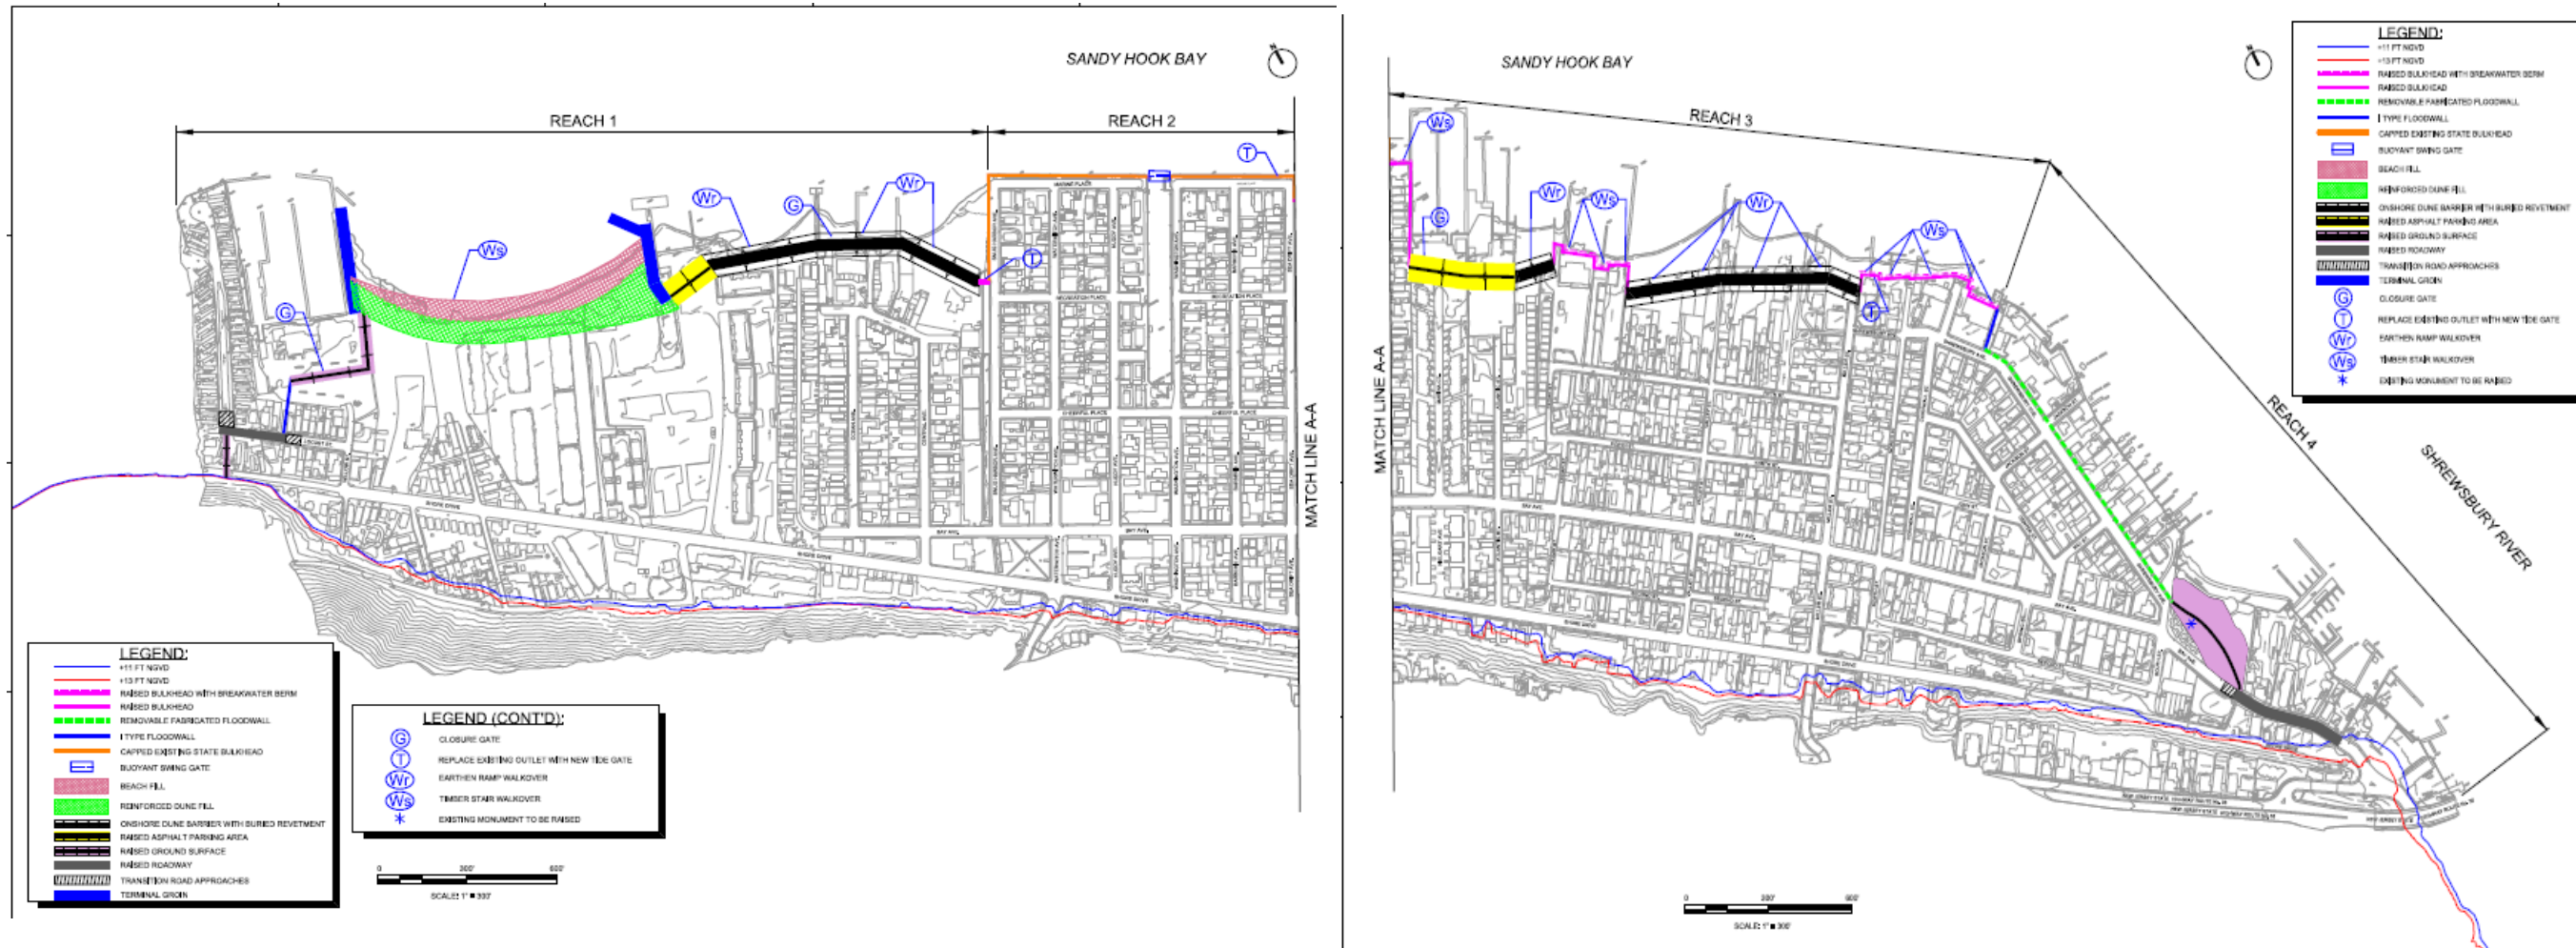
Alternative 4 – Beach and Dunefill Plan
